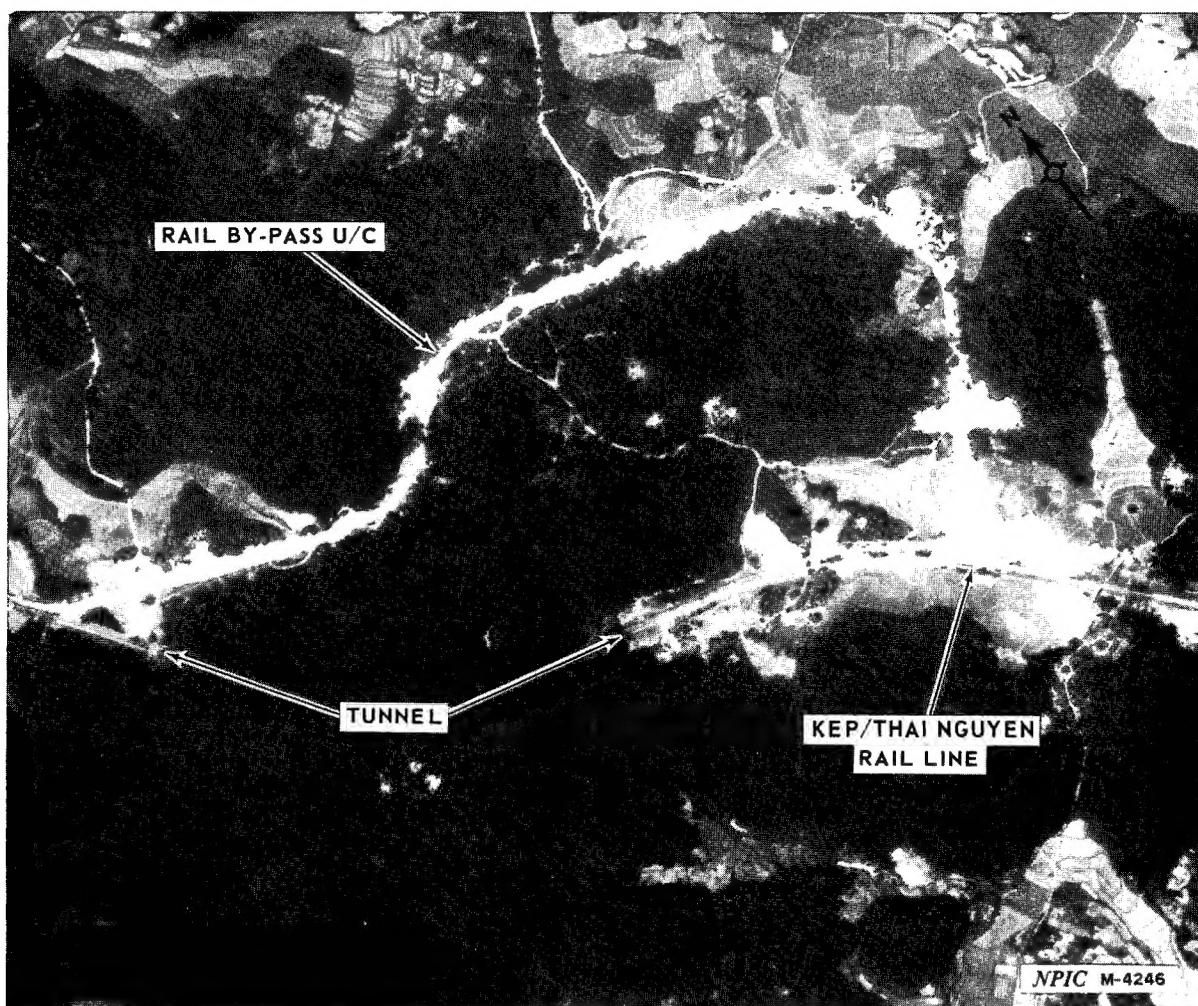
RAIL BY-PASS UNDER CONSTRUCTION AT 21-31N 106-05E AROUND A TUNNEL.
